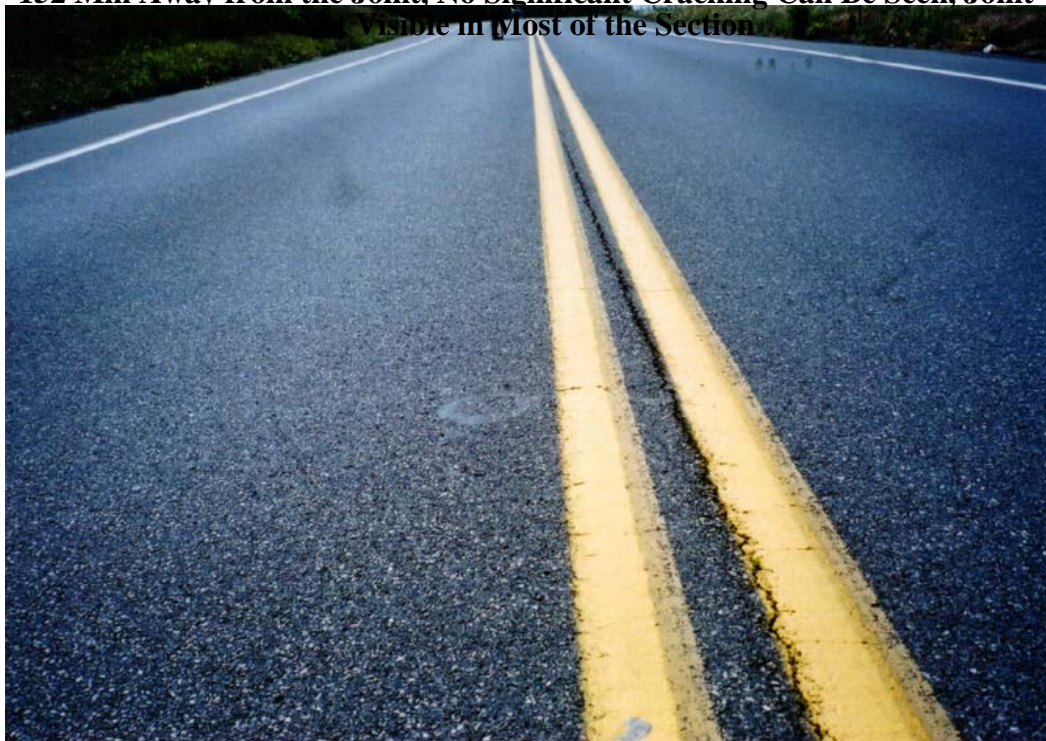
Section Where Joint Maker Used, an Almost Straight Crack with an Average Width of 9.5 Mm Can Be Seen Between the Yellow Stripes
